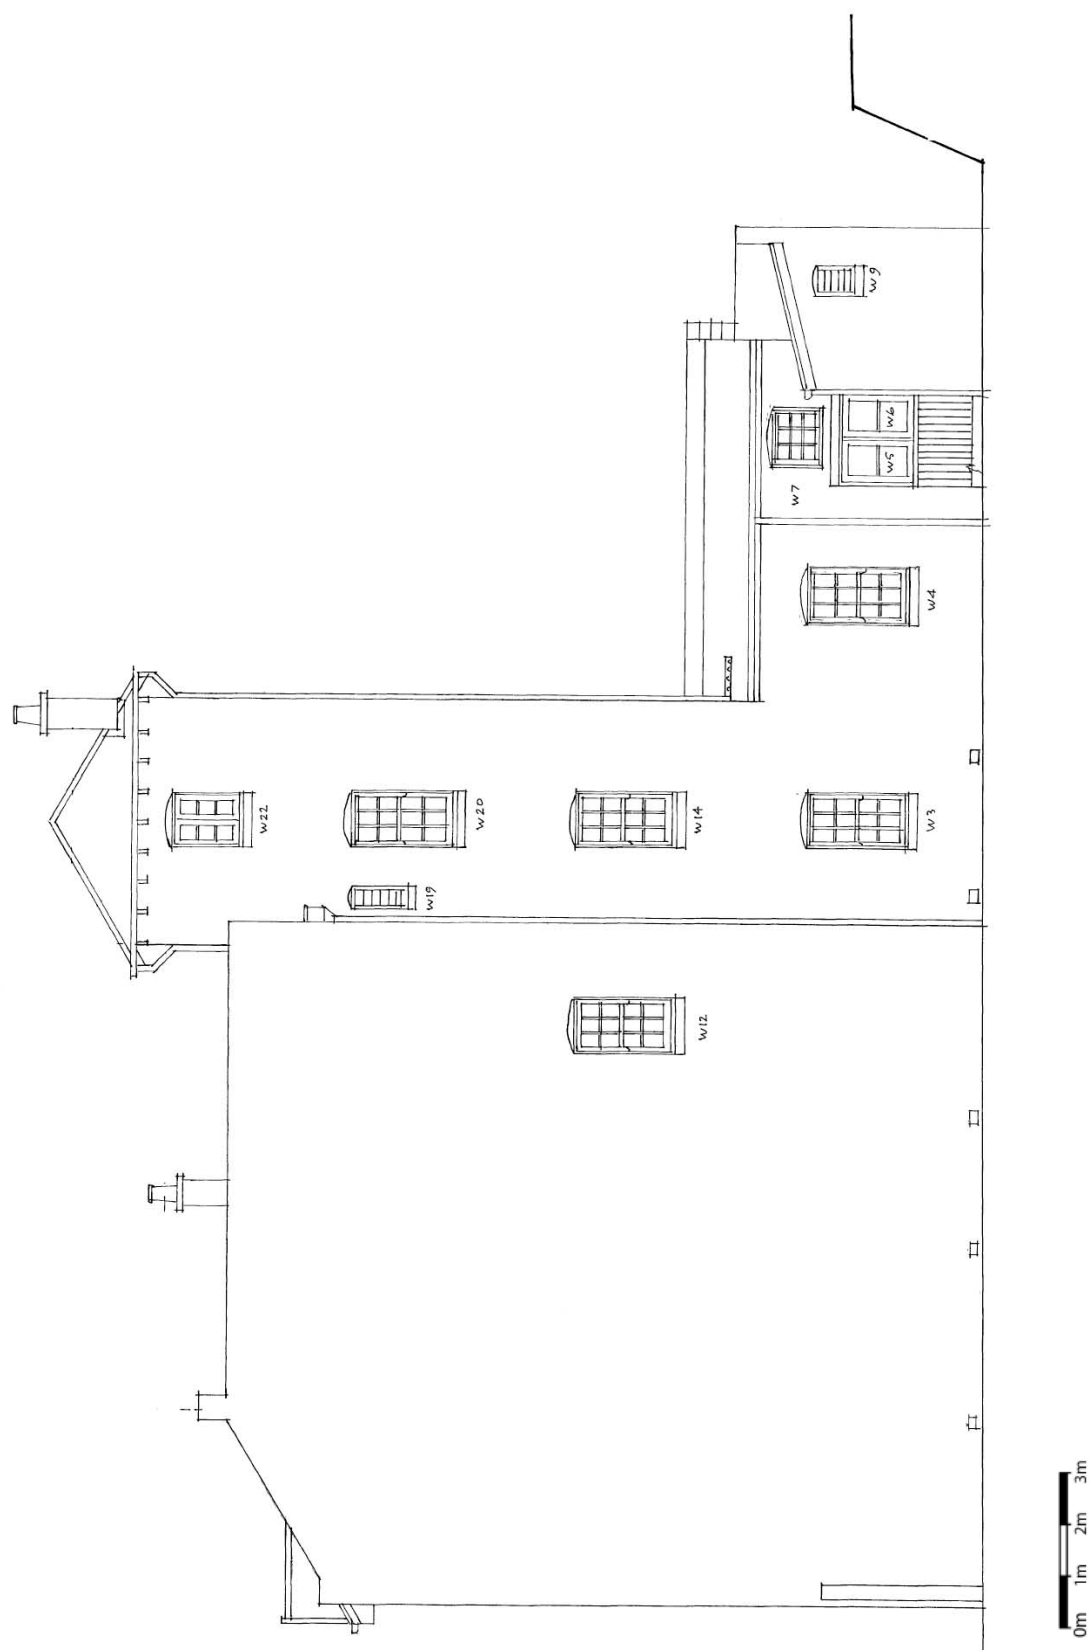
117-117A Gloucester Street – North elevation. Source: CLSP.
